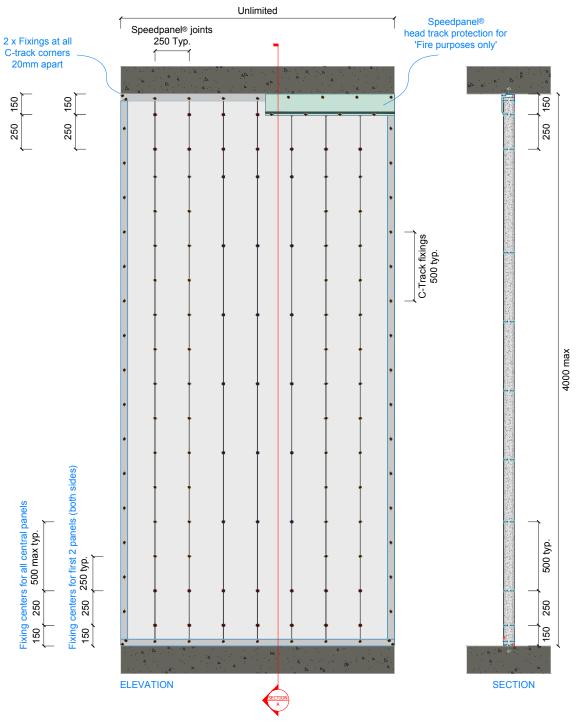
SYSTEM 'C' (ELEVATION & SECTION SYSTEM FIXING LOCATIONS & SPACINGS (CENTRE TO CENTRE)
